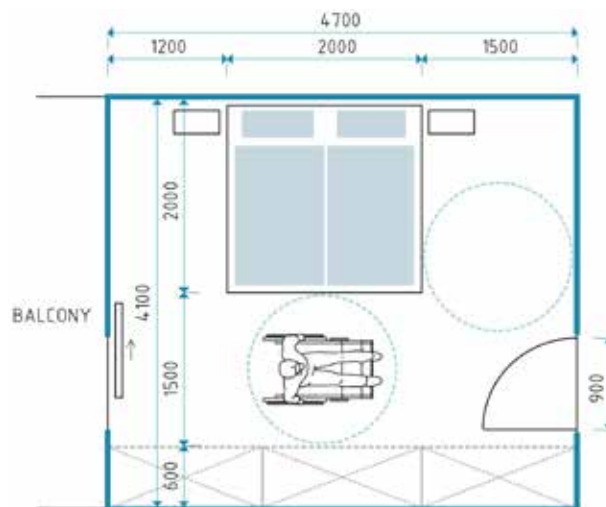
Illustrative floor plan of an accessible bedroom with a double bed (Lacho, Suláková)
